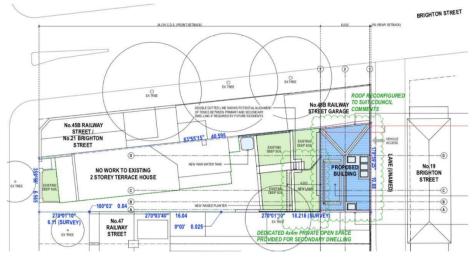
Amended plan with pitched roof, hipped at exposed north end following example of 19 Brighton Street on opposite side of laneway. (Ref: DA page 3/32)
